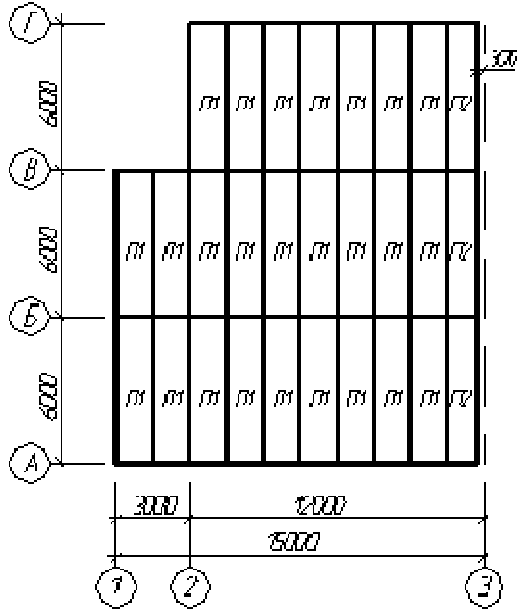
The layout of the floor slabs on the resp. 4,200 in axes 1-3.
